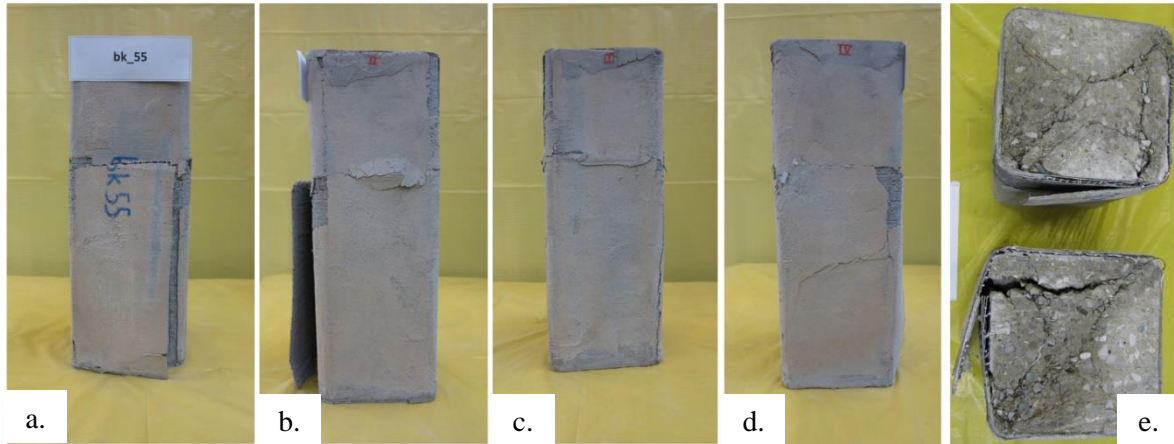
Failure mode of steel-FRCM confined specimen (specimen SQ-450-HD-CM-R-1F-1L-2 shown): a) front face; b) right face; c) back face; d) left face; e) cut section.
